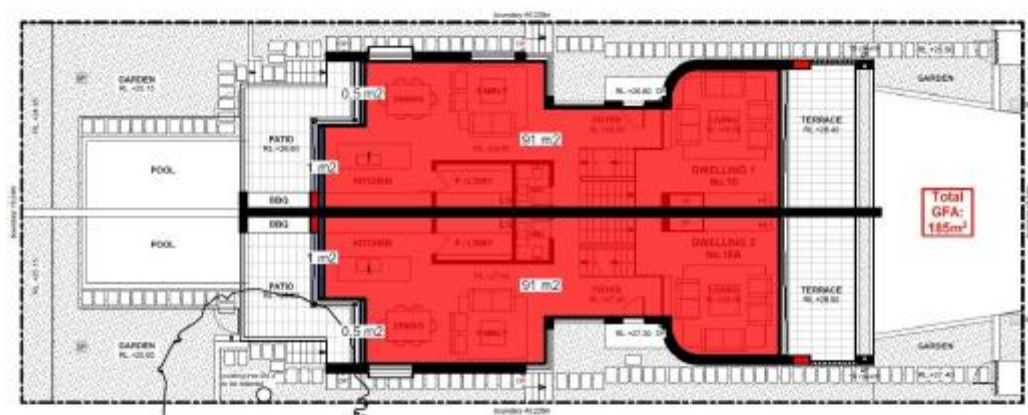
Ground Floor GFA Calculation Plan (GFA: 185m²)
